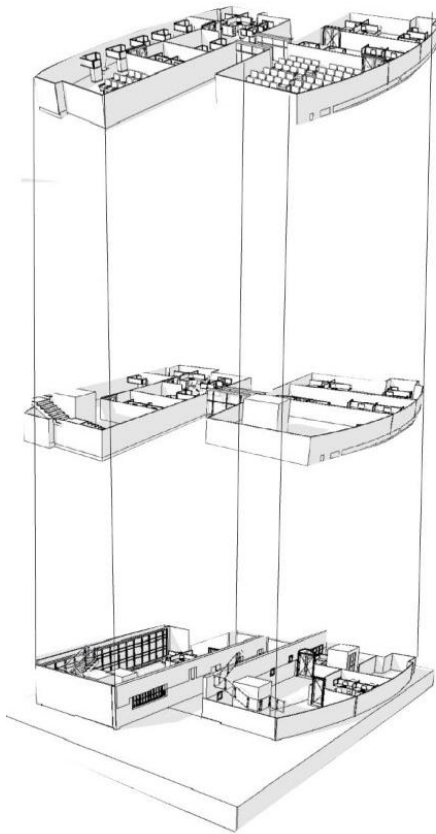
Awash and former EBC buildings 3 floors buildings 3 selected floors
